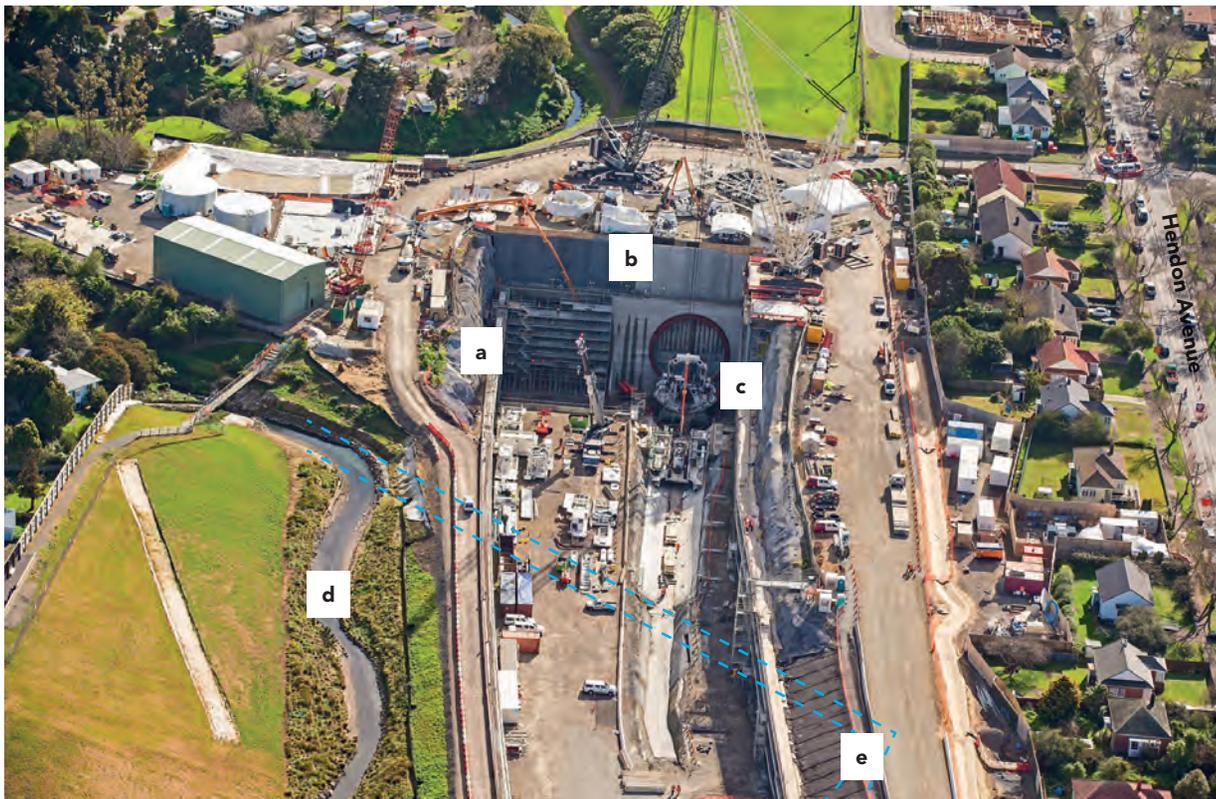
North aerial view of SAT on 7 August 2013. a) Western retaining wall RW909, b) Portal headwall RW910, c) Eastern retaining wall RW911, d) Diverted Oakley Creek, e) Position of Oakley Creek prior to diversion
